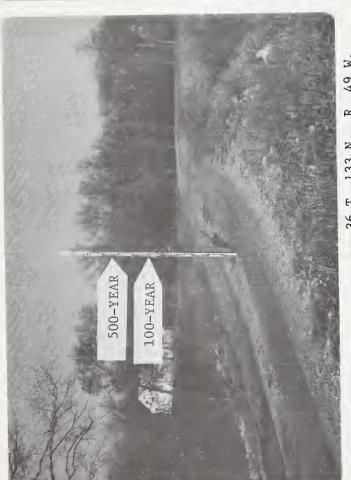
M 16.38 East Bridge Sections 35, T. 133 N., R. 49 W. and 3, T. 132 N., R. 49 W.
